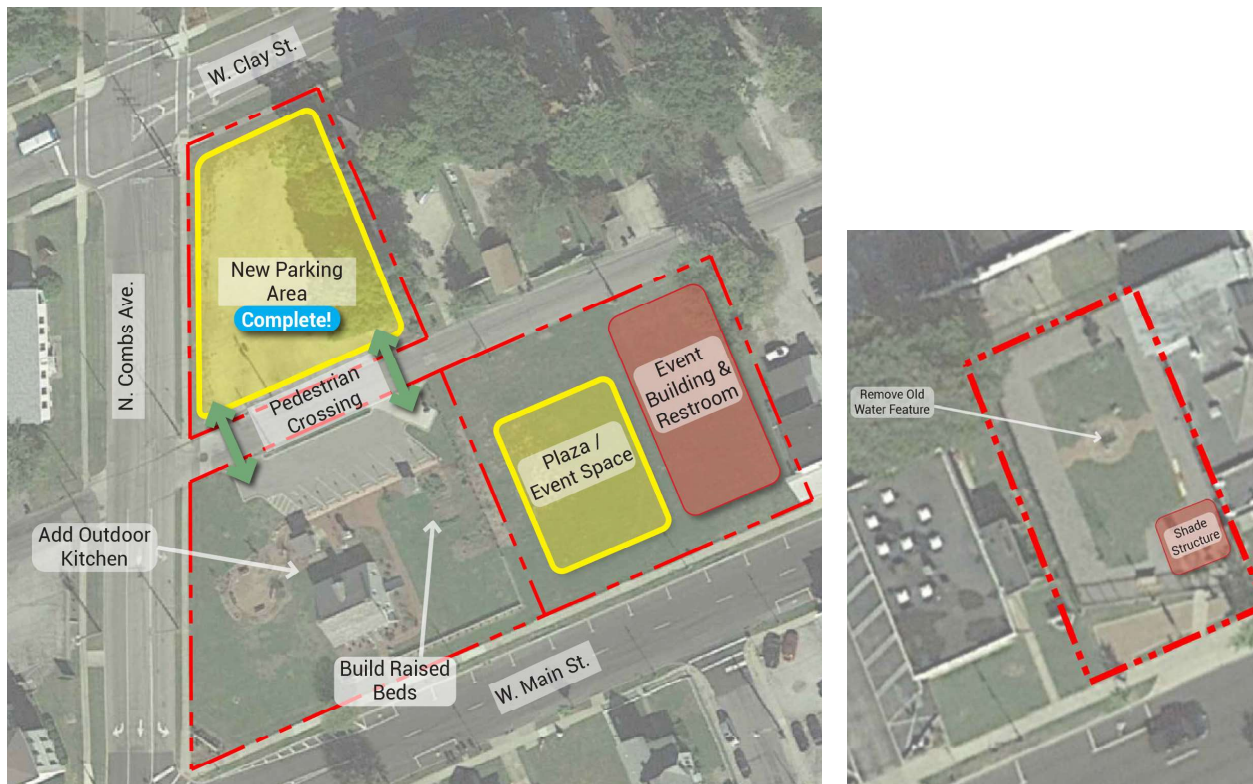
D.D. Collins House & Mutts on Main Conceptual Plans
